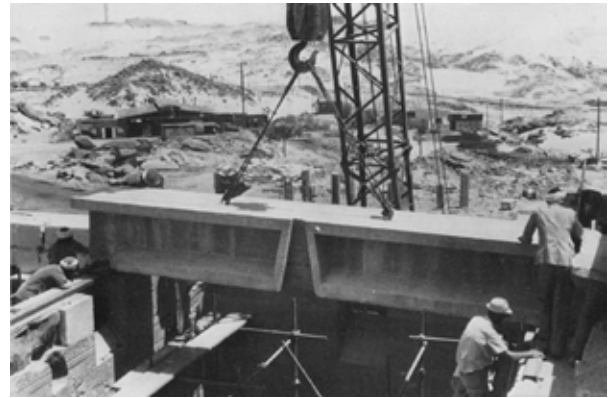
Kalabsha, placing reinforced concrete roof beams. Image from Wright (1972: pl. 79a).
